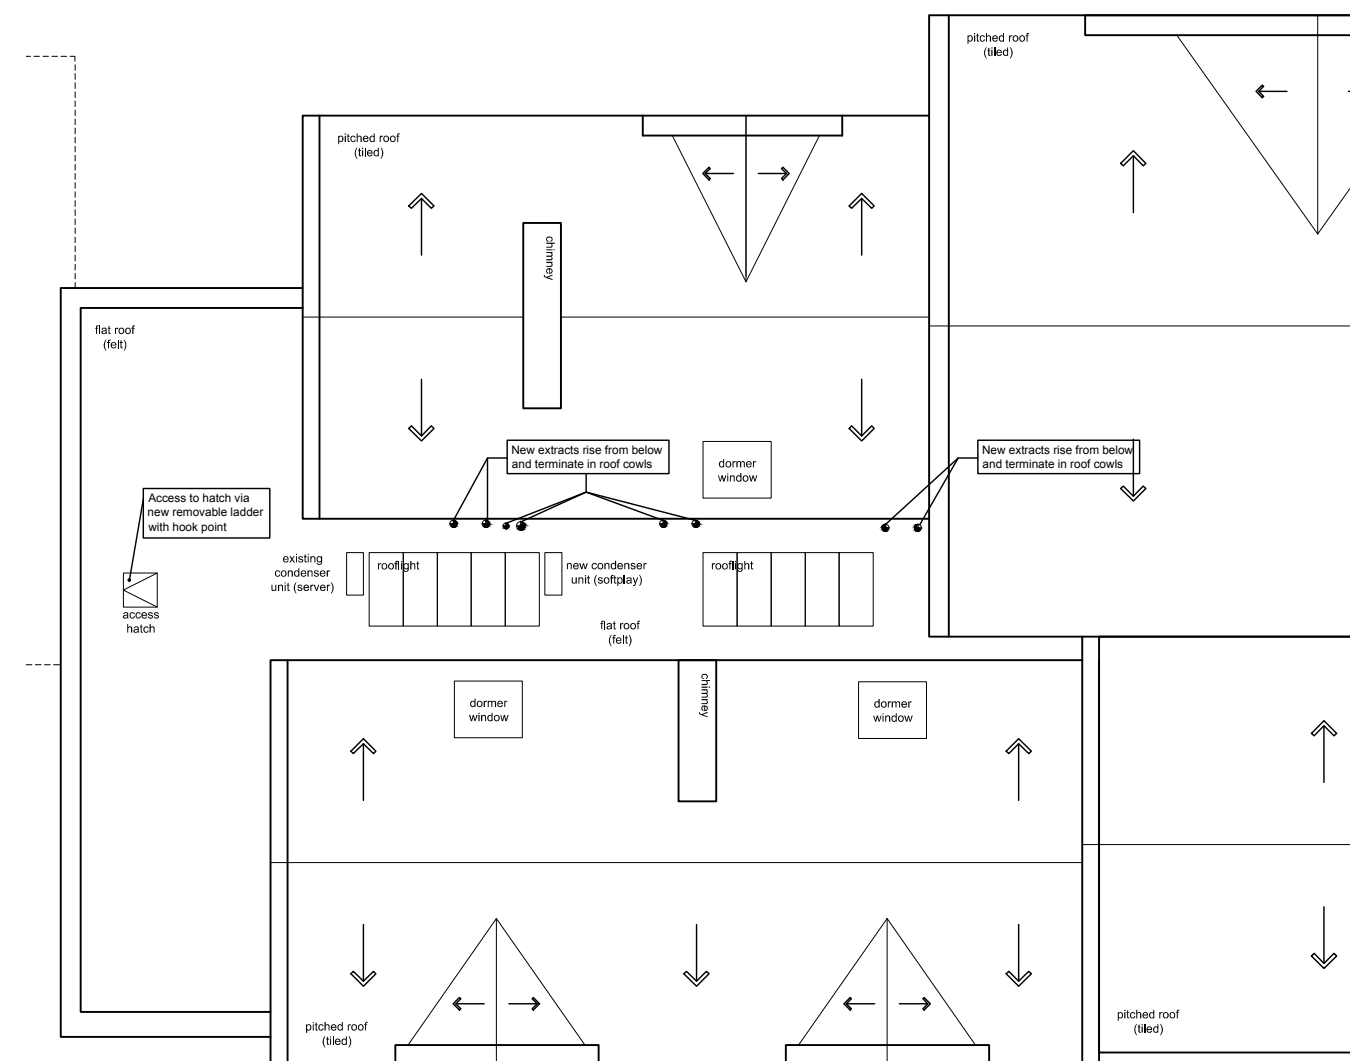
Part Roof plan showing a new condensing unit and extract cowls on the area of flat roof between the extensive front and back gables.
